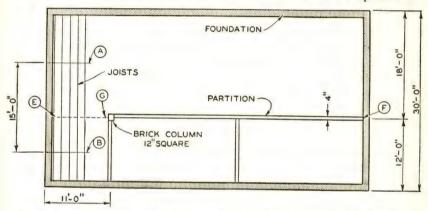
Basement Partitions, When Required, Are Made of Masonry and Are Used to Support Floor Loads
